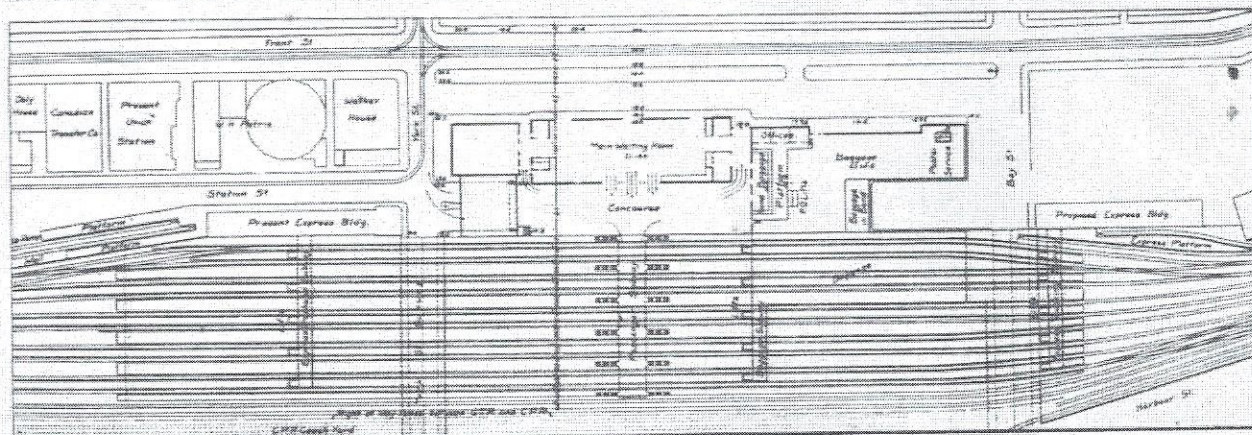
Plan of New Union Station, showing the Trackage, and Passenger and Baggage Facilities.
